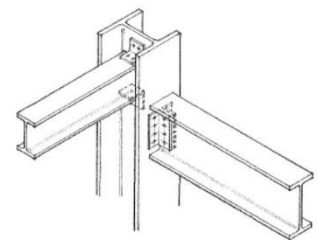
STRUCTURE SYSTEM DETAIL C
